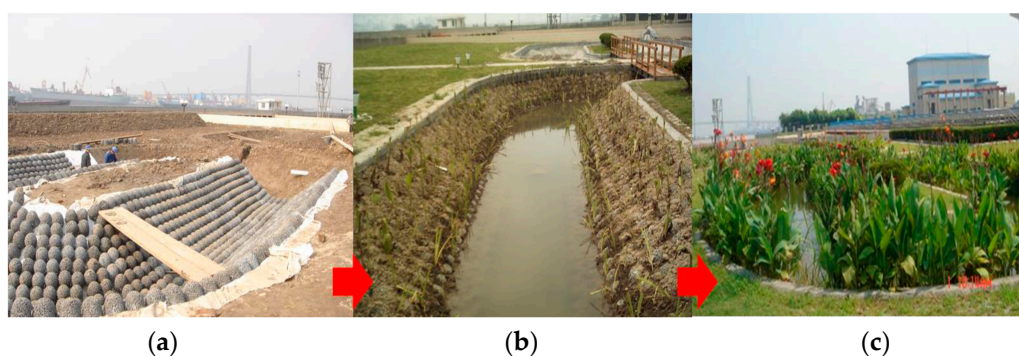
The prefabricated sphere of porous concrete and aquatic plant involved in bank slope ecological revetments for Ditch A. (a) porous concrete pavement (b) backfilling soil (c) planting cultivation.
